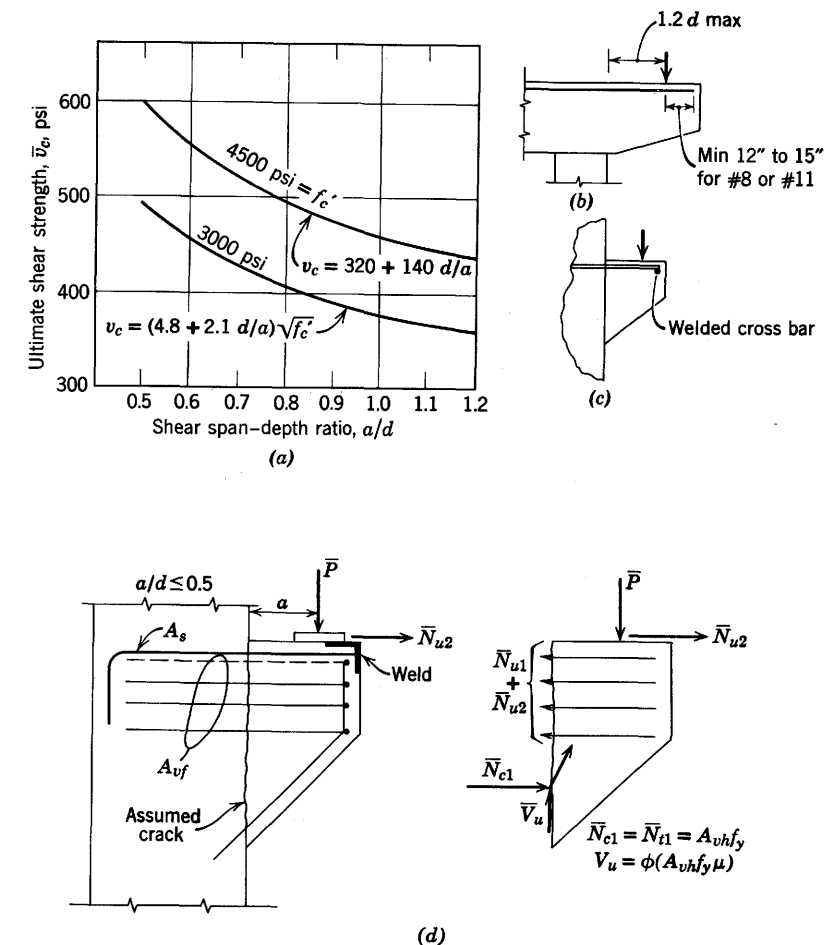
Brackets and short cantilevers. (a) Author's unit shear strength, v_c . (b) Minimum end anchorage for values in (a). (c) Preferred end anchorage in short bracket. (d) Shear-friction applied to bracket design.
